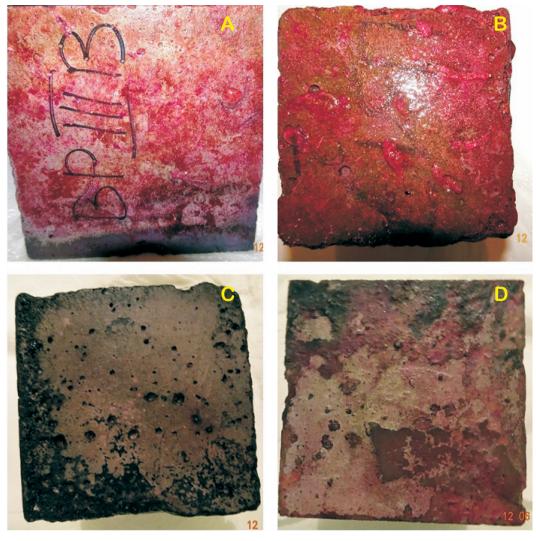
Image of Rose Bengal stained surface of BP and LB concrete cubes (experiment 2) Side walls: concrete BP (A), and concrete LB (B); undersides: concrete BP (C), concrete LB (D).
